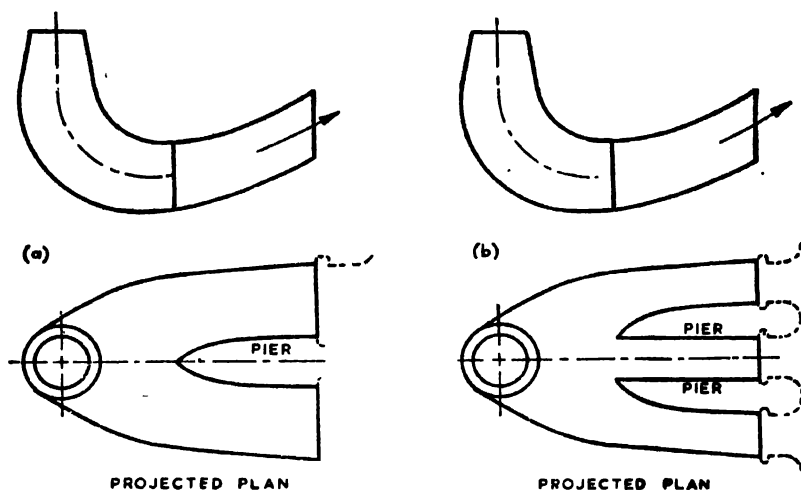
Elbow Type Draft Tube (a) Single Pier Type (b) Double Pier Type
